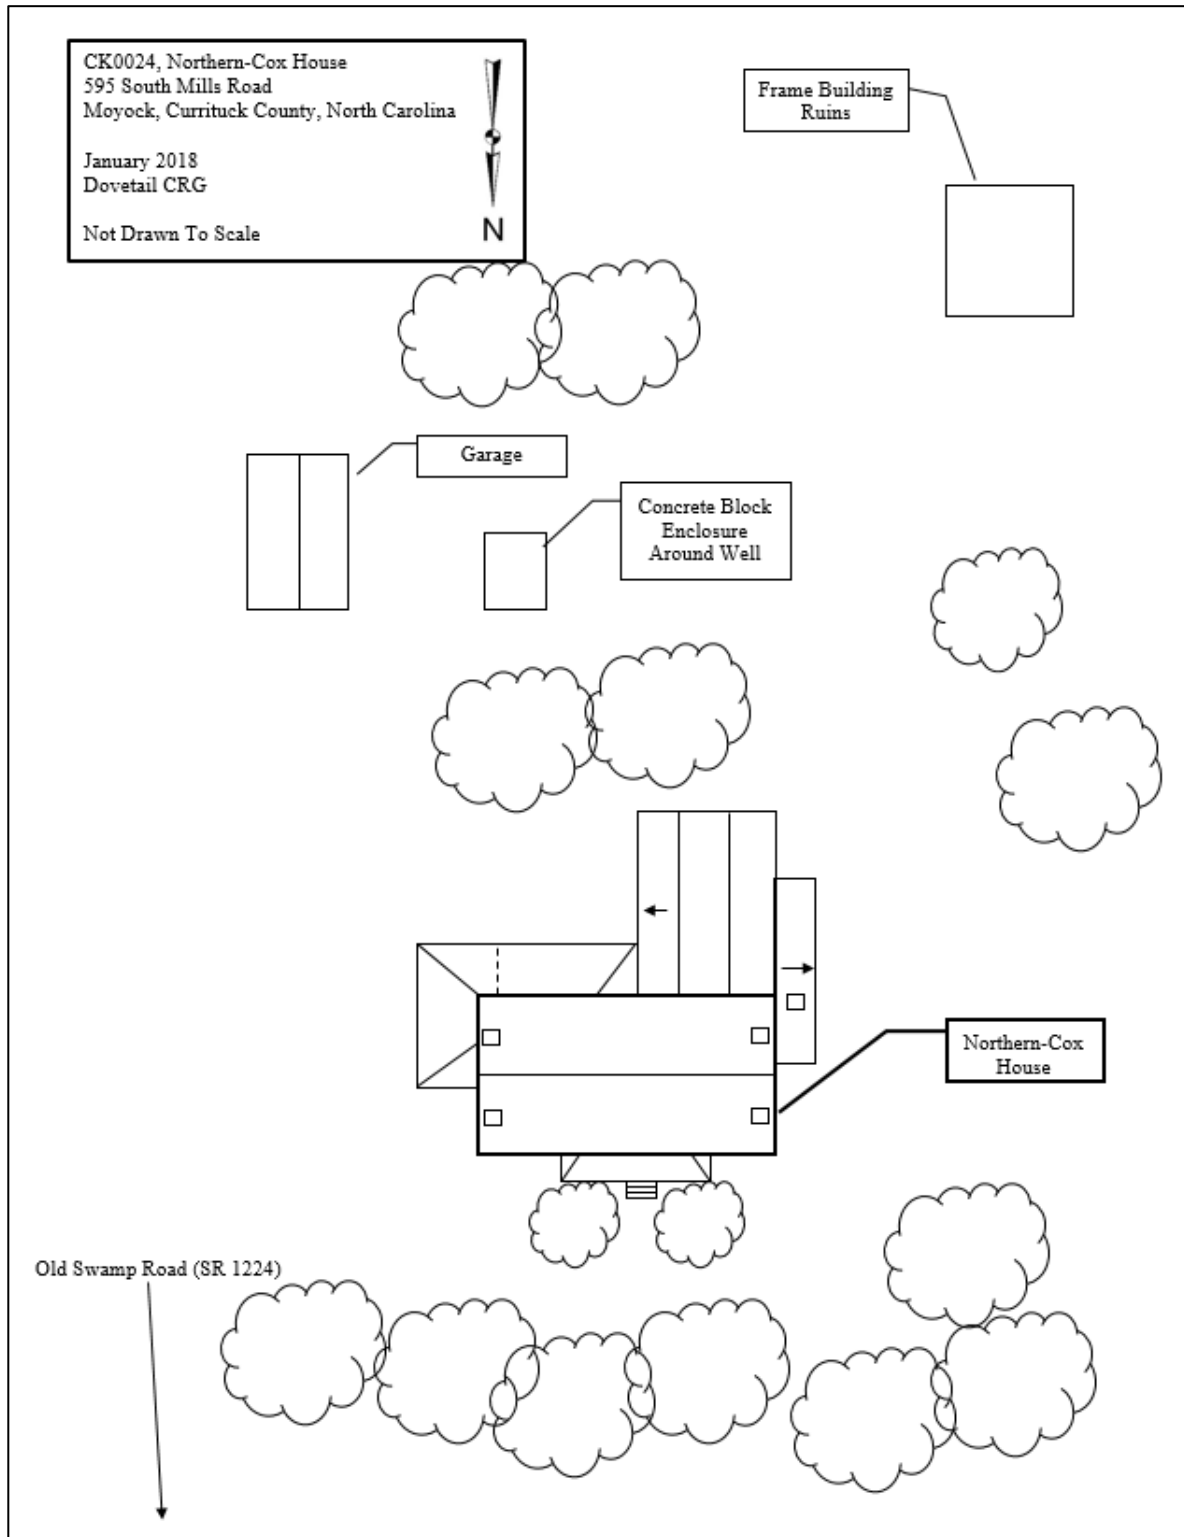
Northern-Cox House (CK0024) Site Plan. Not to scale.
